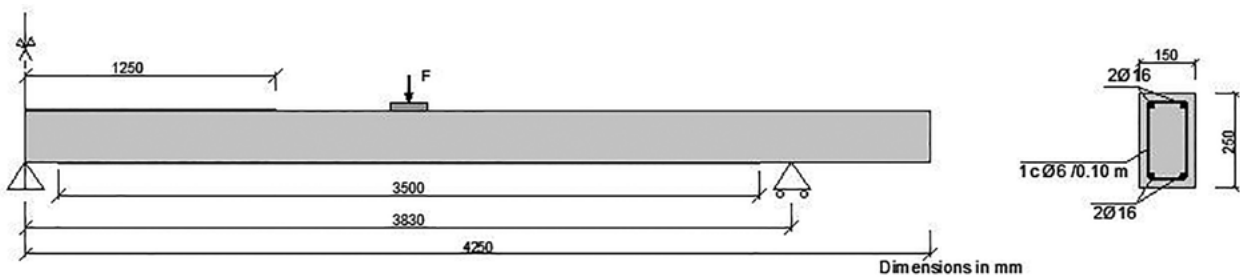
Geometry and test set-up of Beams E1, E2, E3 and E4.
